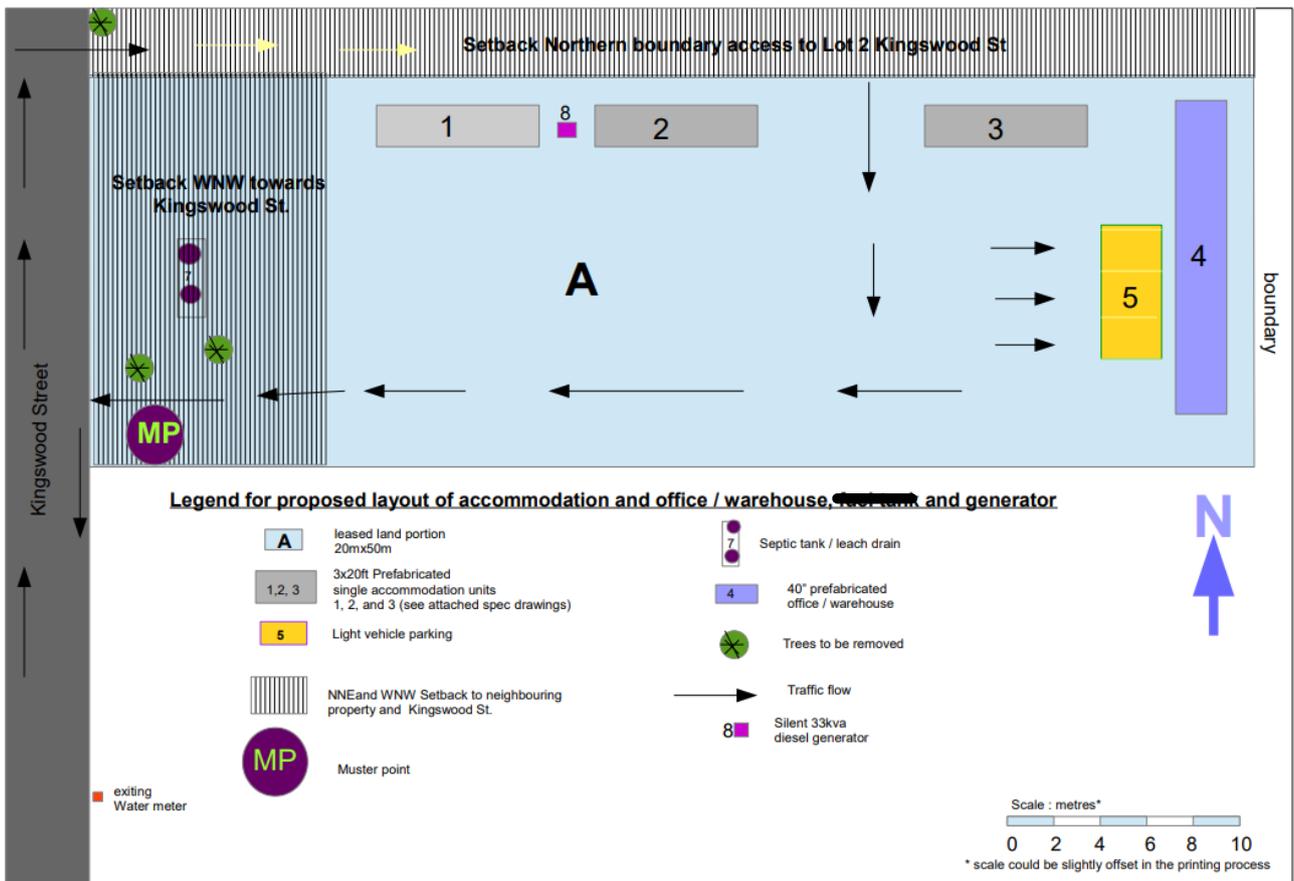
Site plan detailing setbacks, orientation of prefabricated suites, location of sewer system, generator, emergency management and traffic flow
